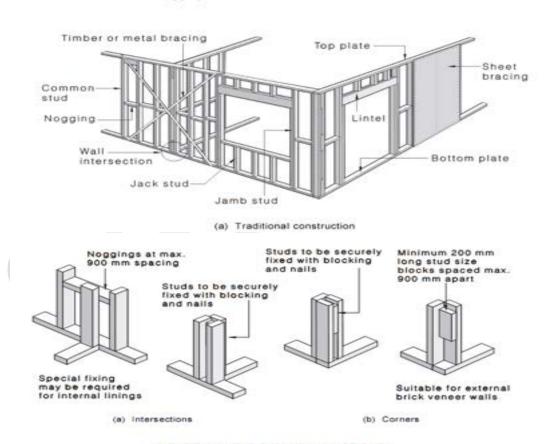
TYPICAL WALL JUNCTIONS
